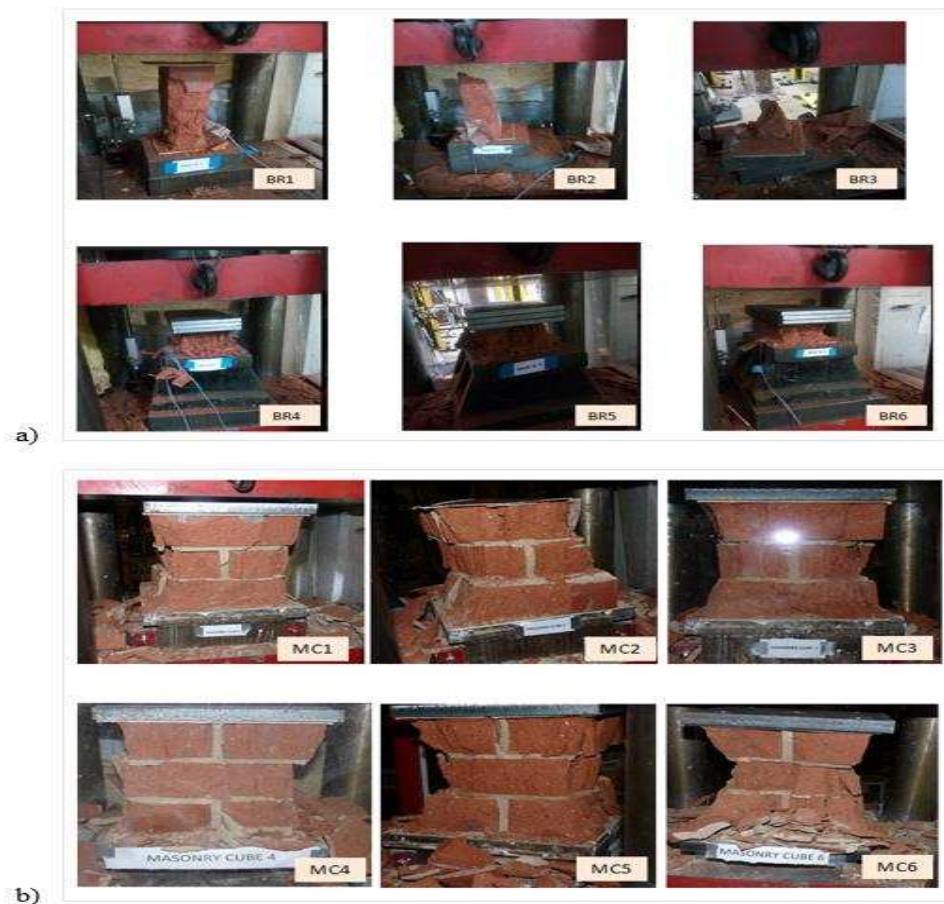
Failure modes of (a) brick units (b) masonry cube
